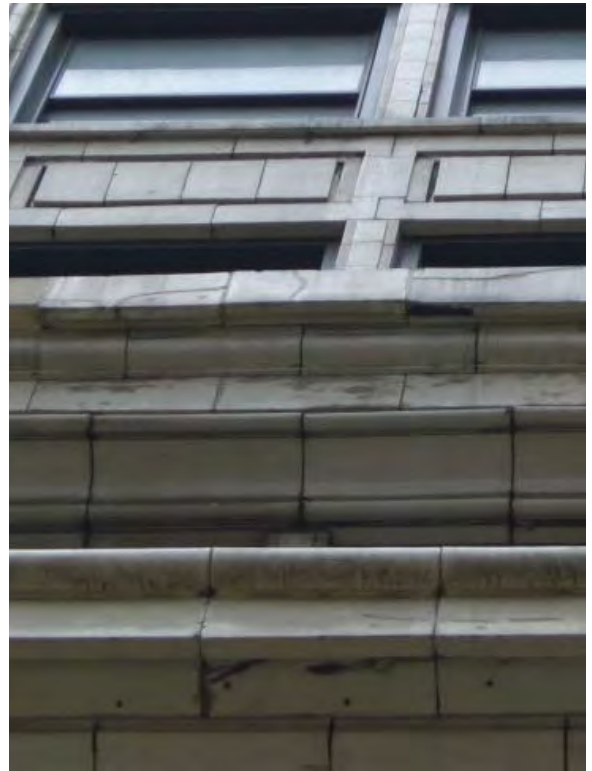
Stresses in terra cotta resulting from anchor failure and stresses in wall.
